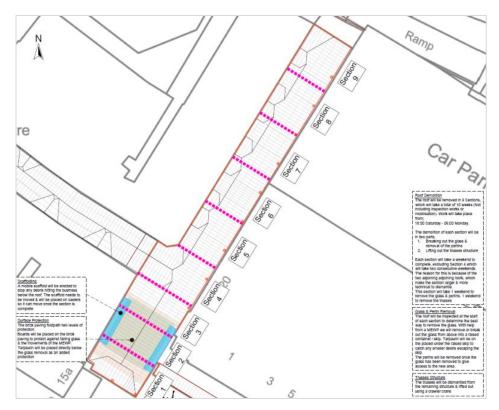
Sectional Drawing showing the 9 canopy bays that exist within the glazed roof structure
